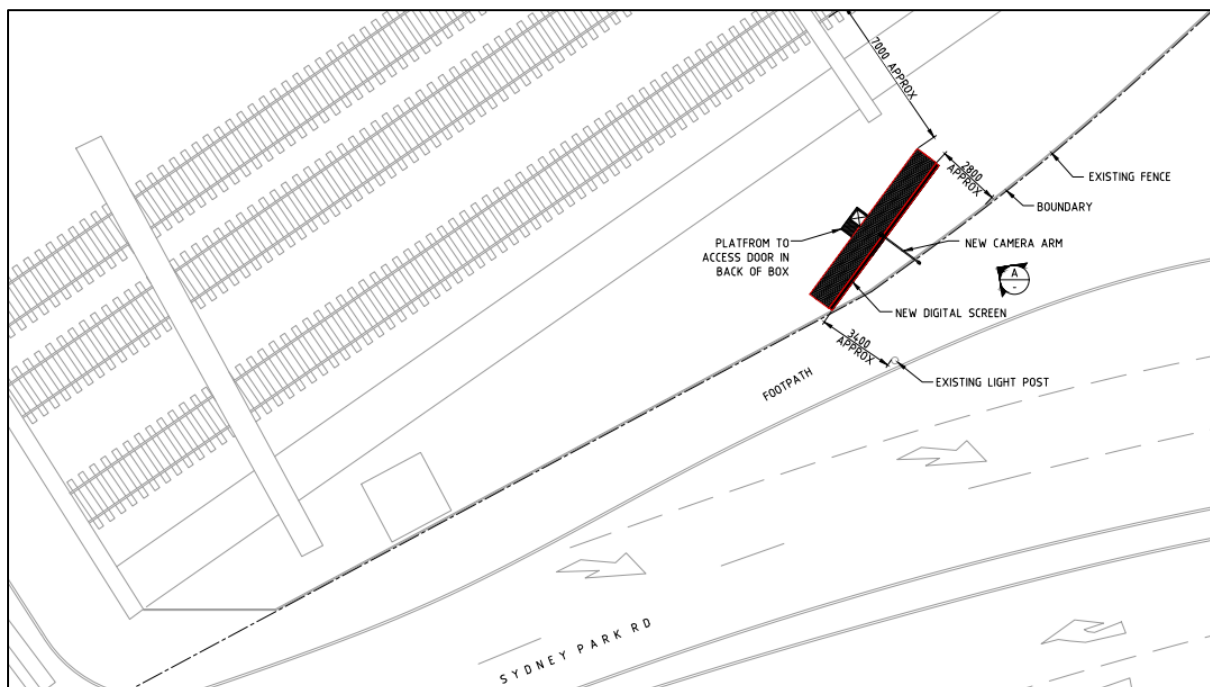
Site plan (Dennis Blunt Consulting Engineer, 2023)
